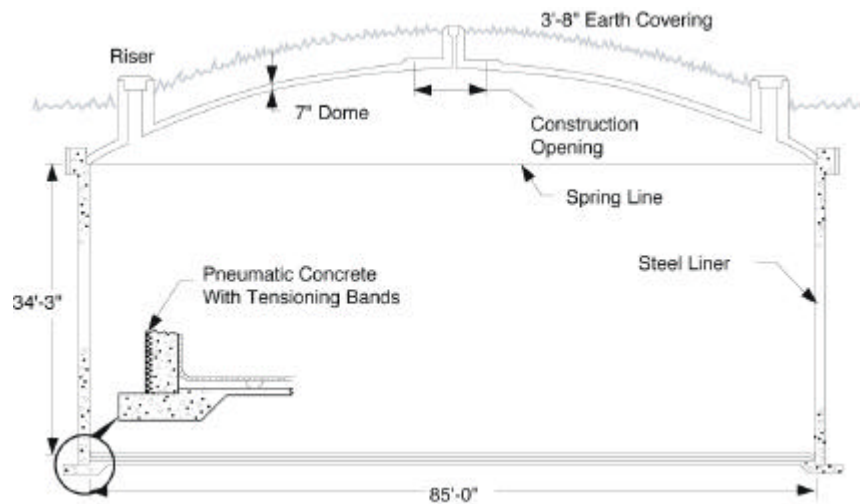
Uncooled Waste Storage Tank, Type IV (Prestressed Concrete Walls, 1,300,000 Gallons).
